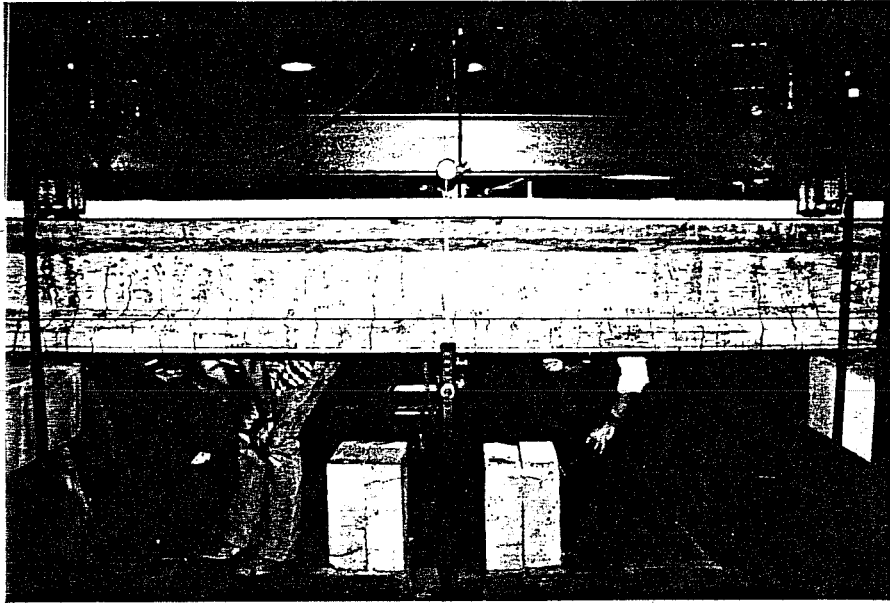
Photograph of crack pattern at load of 9.35 kips during ultimate flexure test - Specimen 1
